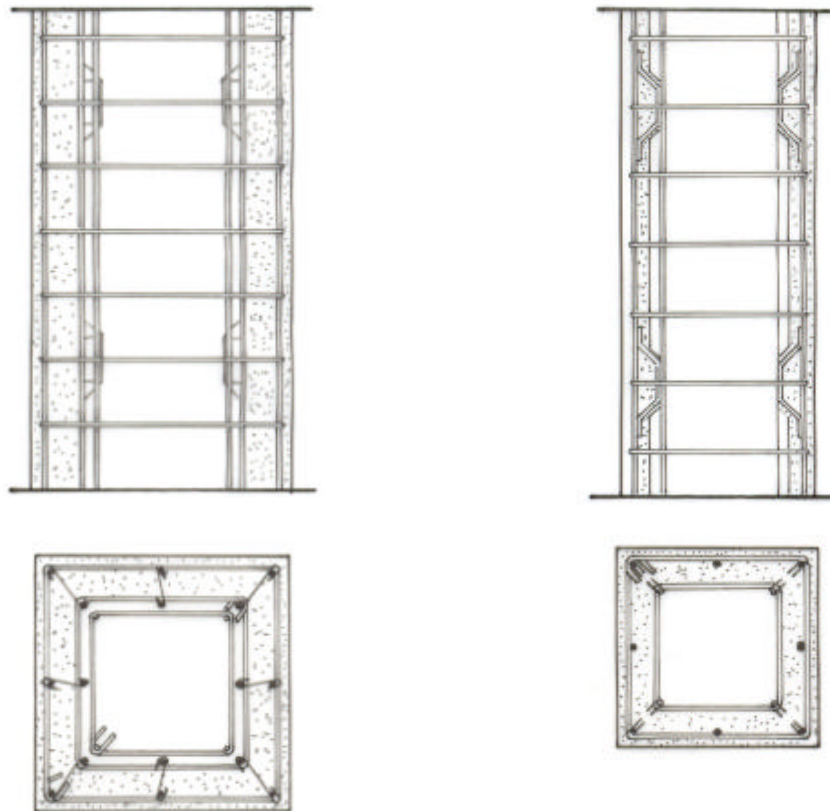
a)Elastic b)Rigid connection of additional reinforcements to existing reinforcements [46]
